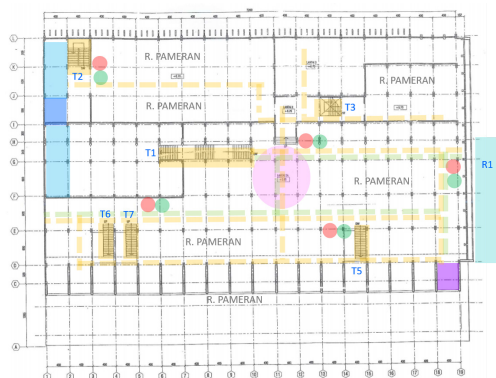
Layout and circulation of exhibition hall, 3rd floor
